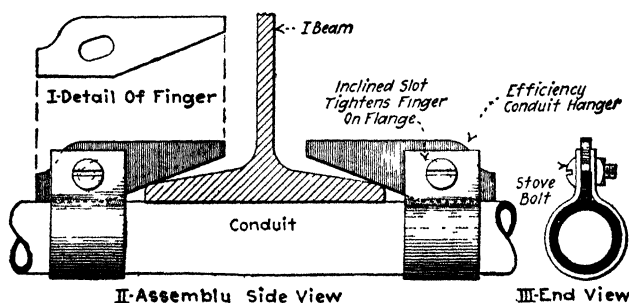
“Efficiency” conduit hanger. Made regularly in different sizes for conduits ranging in size from $\frac{1}{2}$ in. to 4 in.; larger sizes are made special. The fingers are adjustable so as to “take” metal flanges ranging from $\frac{1}{16}$ in. to $\frac{5}{8}$ in. in thickness. (Efficiency Electric Company, East Palestine, Ohio.)
